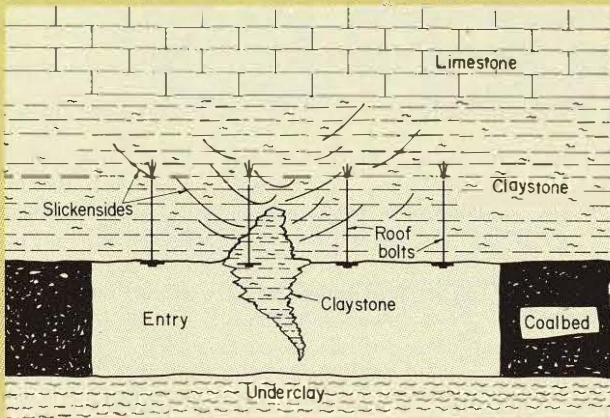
Subtype G₄ roof failure attributed to a paleochannel (roof roll).
